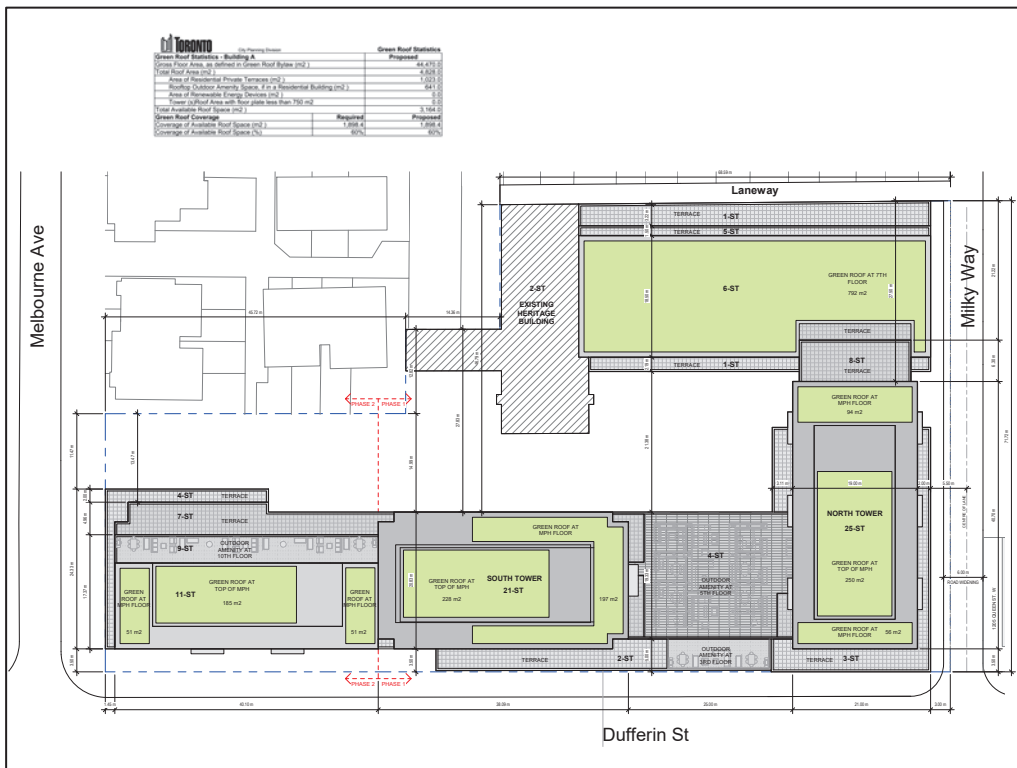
Roof Plan with Green Roof Areas (Sweeny & Co)
